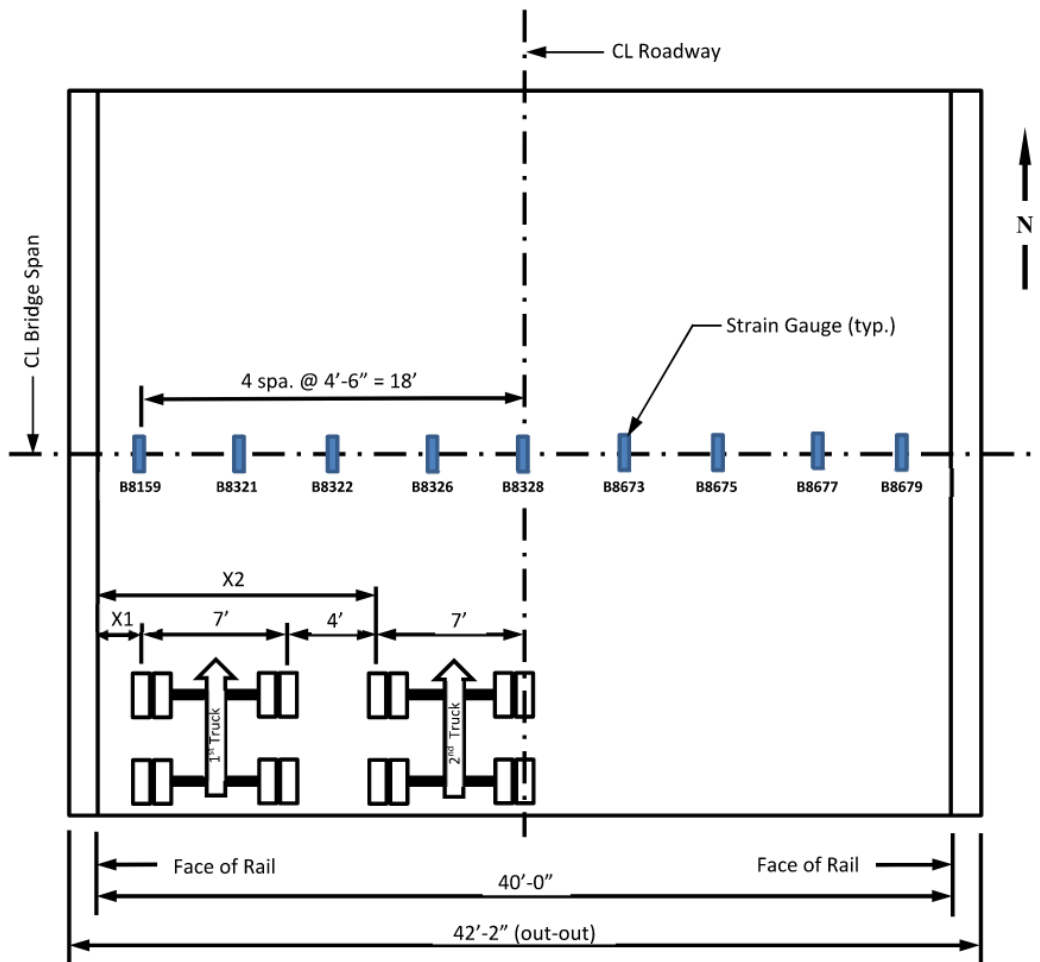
Illustration. Instrumentation plan of 0740013 bridge.
